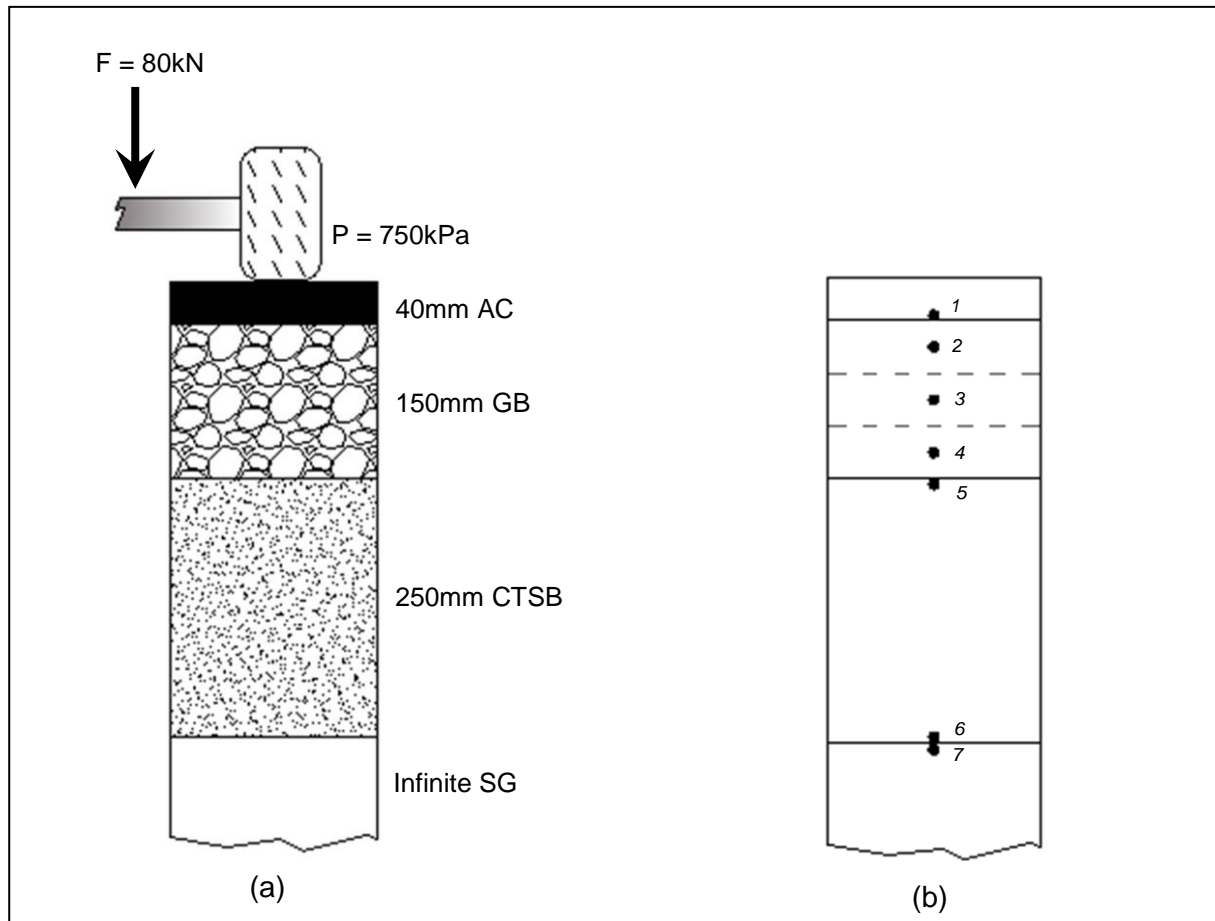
Typical cross section of the pavement. (a) Loading conditions, (b) Critical positions of failure
